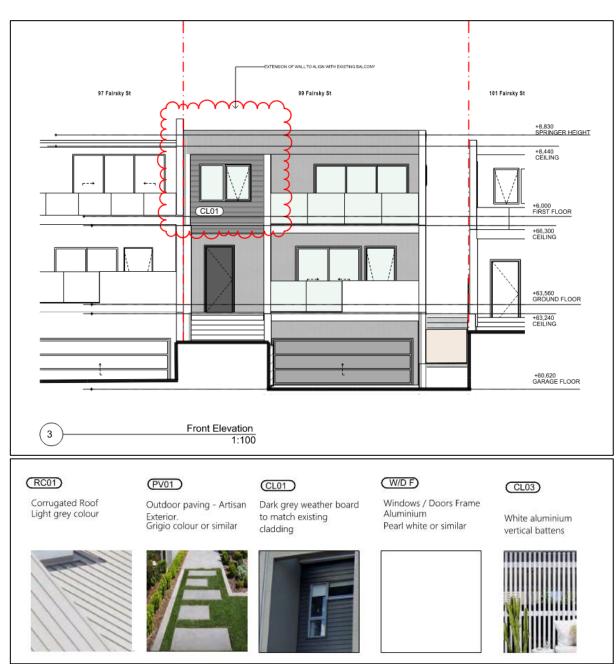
Amended Front Elevation Plan to clearly demonstrate material, texture and colour of proposed first-floor extension. Source: Applicant's submitted amended architectural plans, 15/10/2024.
